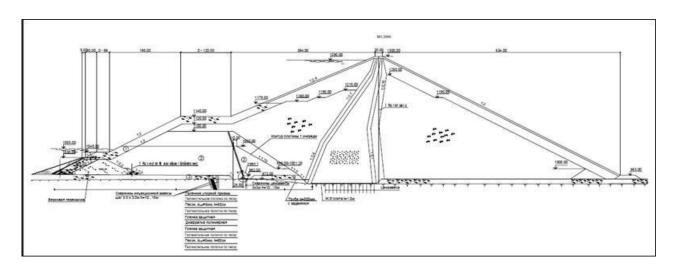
Calculation cross section (Dam stability 3D modelling, Hydroproject, 2009)
